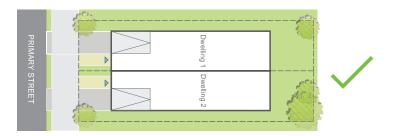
Desired development - dwellings are orientated towards the street frontage
